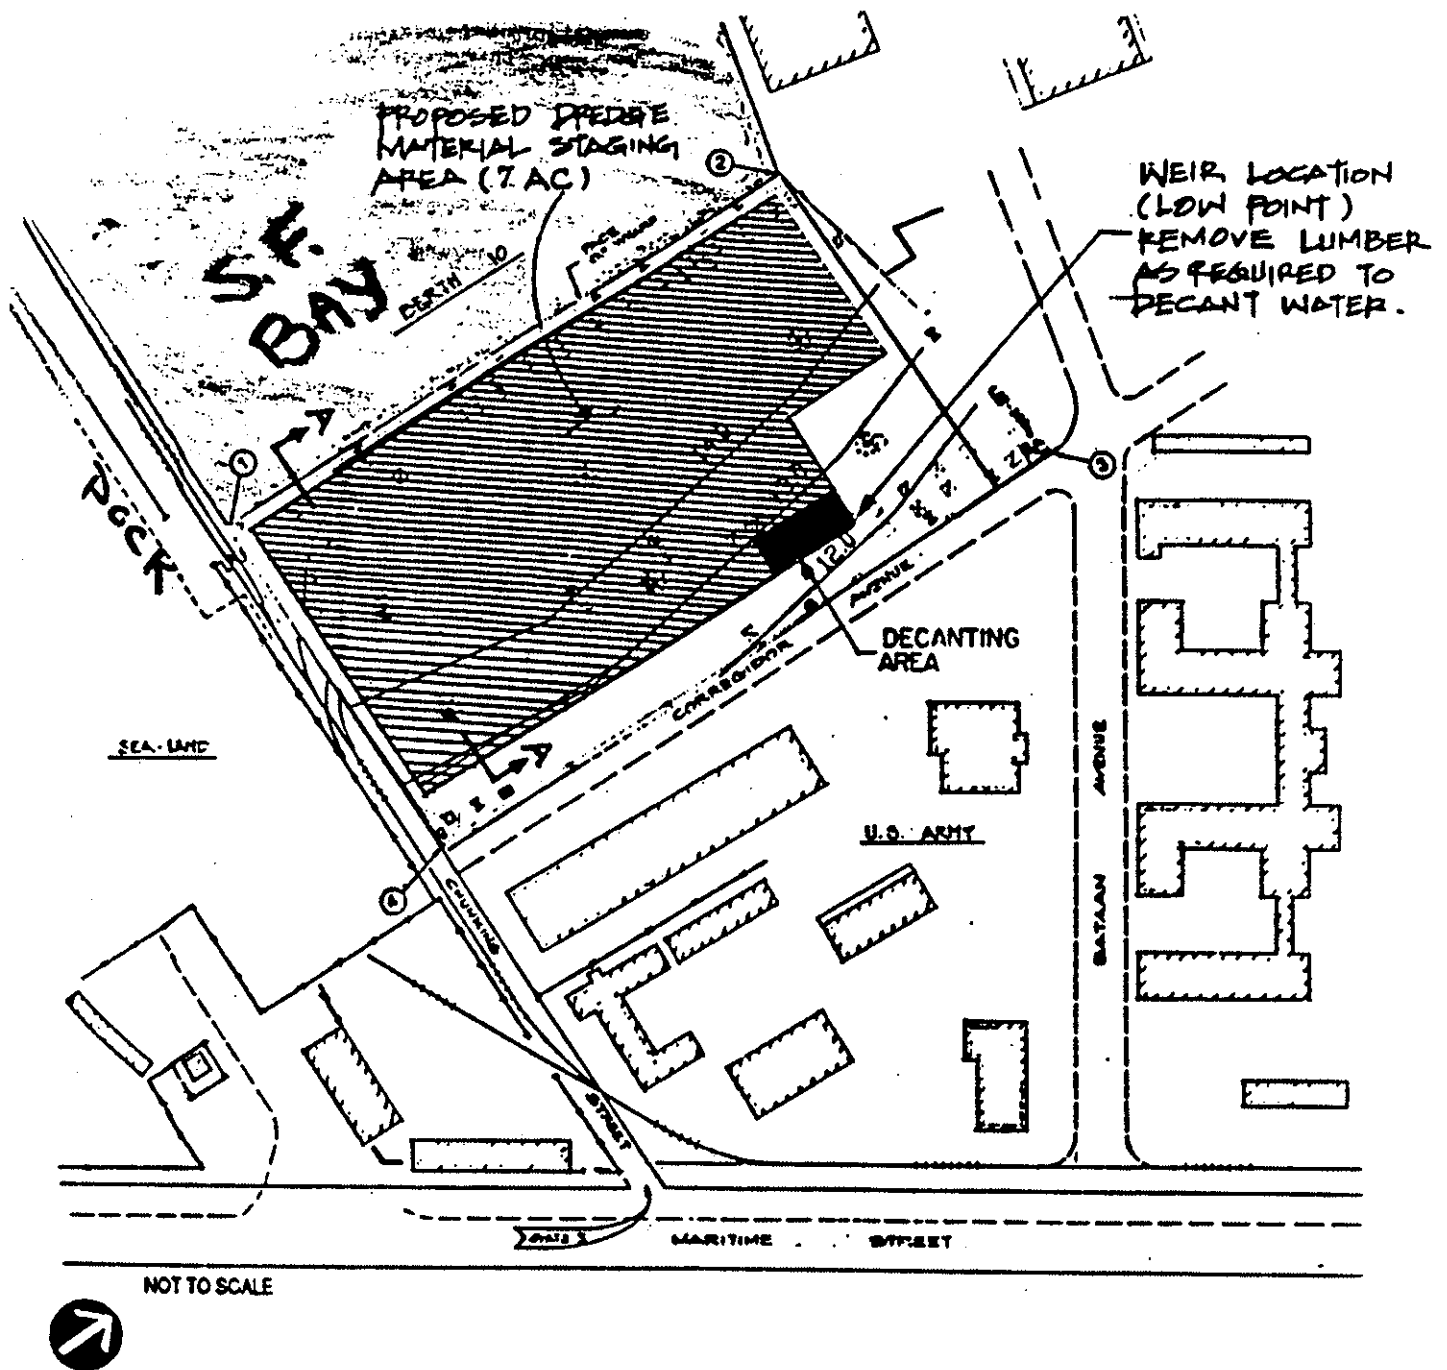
Berth 10 Dredged Sediment Rehandling Facility – Site Map
